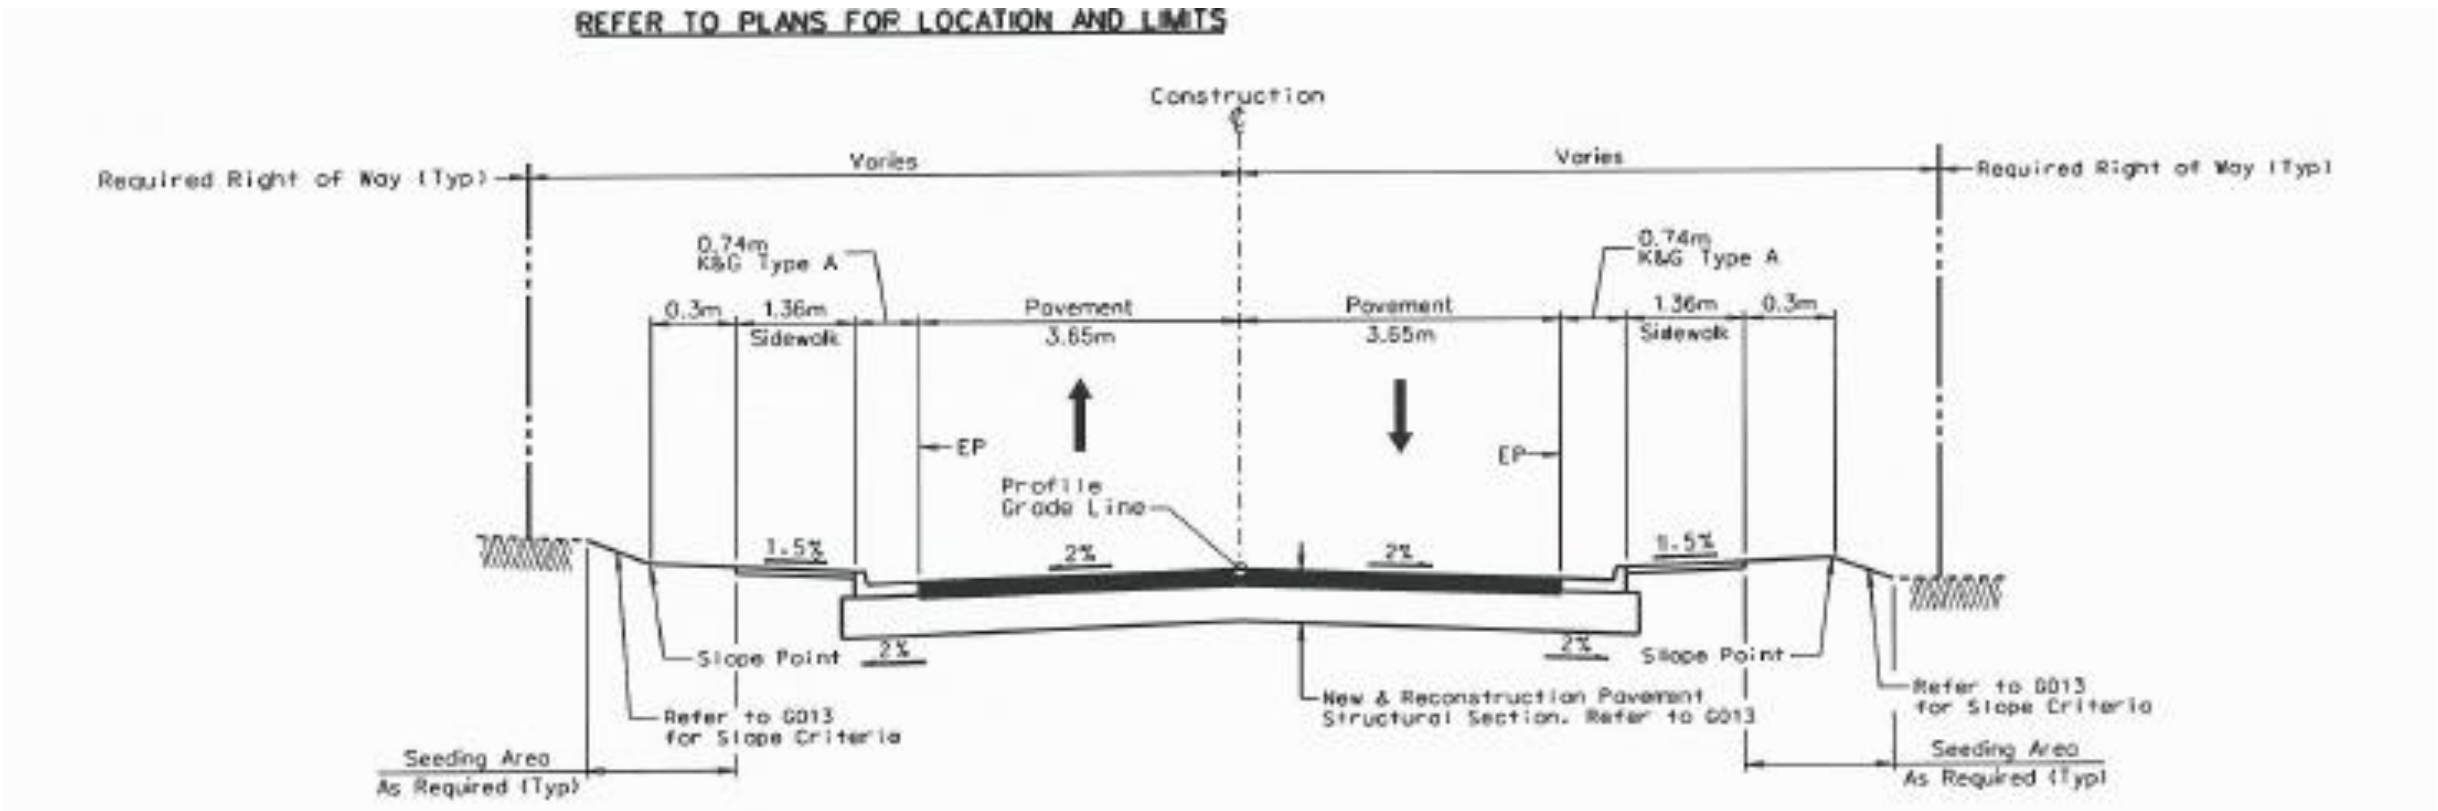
Typical road section between chainage 116+043 and 123+520, with design speed 65 km/h
